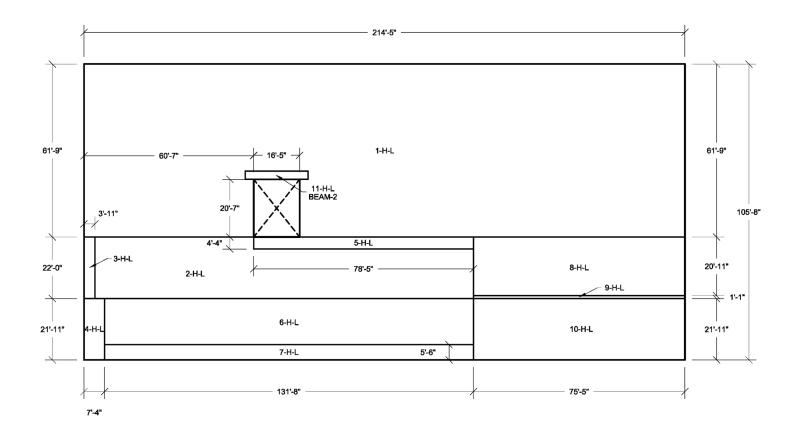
H.3-13 South Wall Looking North Horizontal Reinforcement Zones Near Side Face
